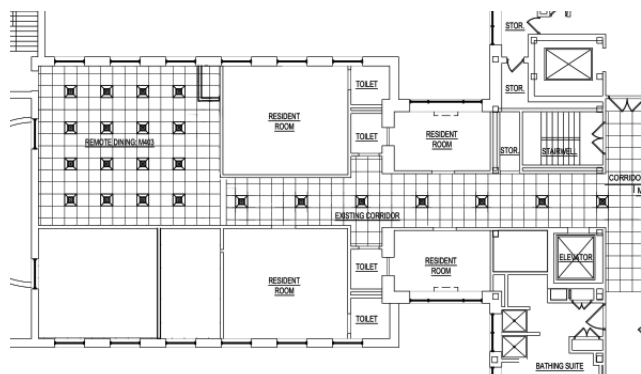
Reflected Ceiling Plan of Transition Wing. Source: (Author 2013).
